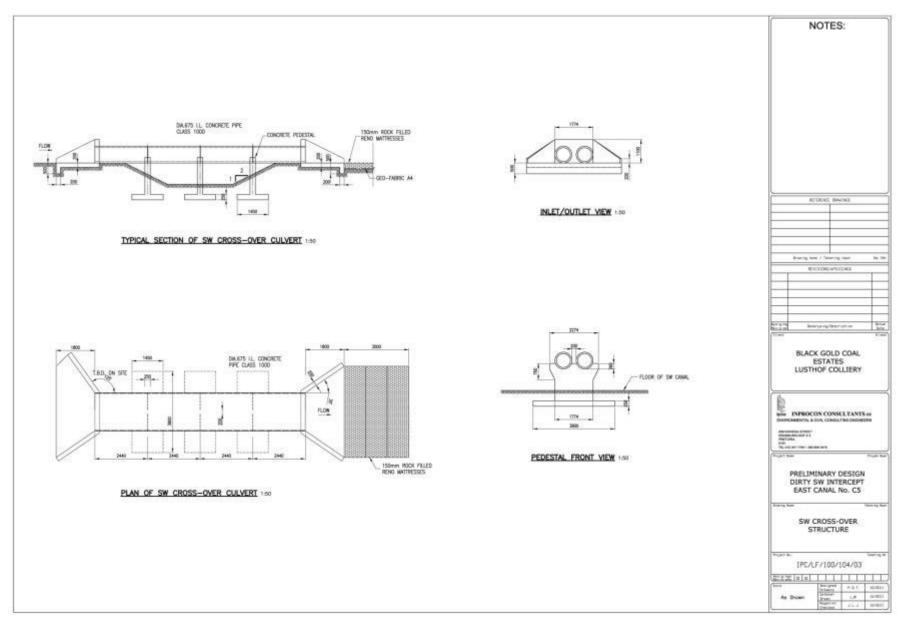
(a): Storm Water Cross-Over Structure.
